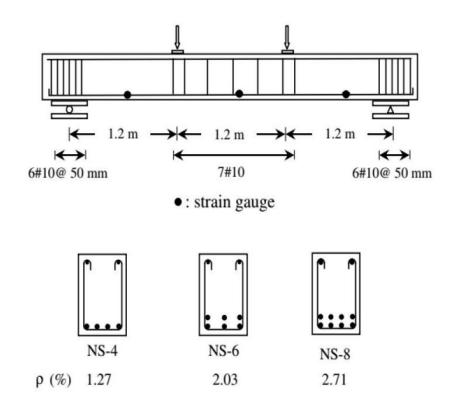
Beams detailing and test setup (Arezoumandi, et al., 2014)
